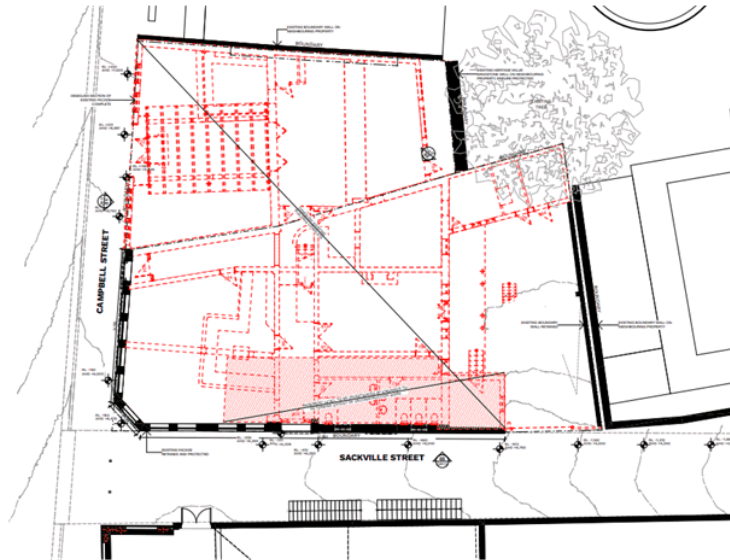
Proposed Demolition – Ground Floor Plan (Source: Cumulus)
